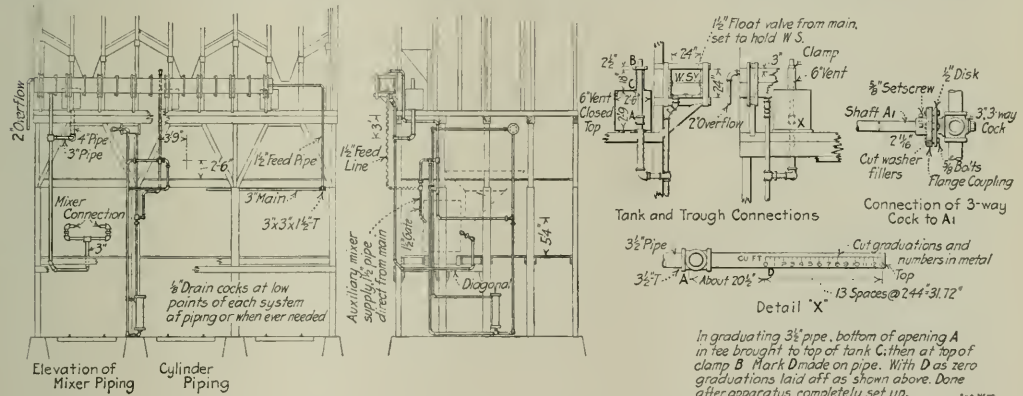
PIPING ARRANGEMENT, ELEPHANT BUTTE MIXING PLANT
